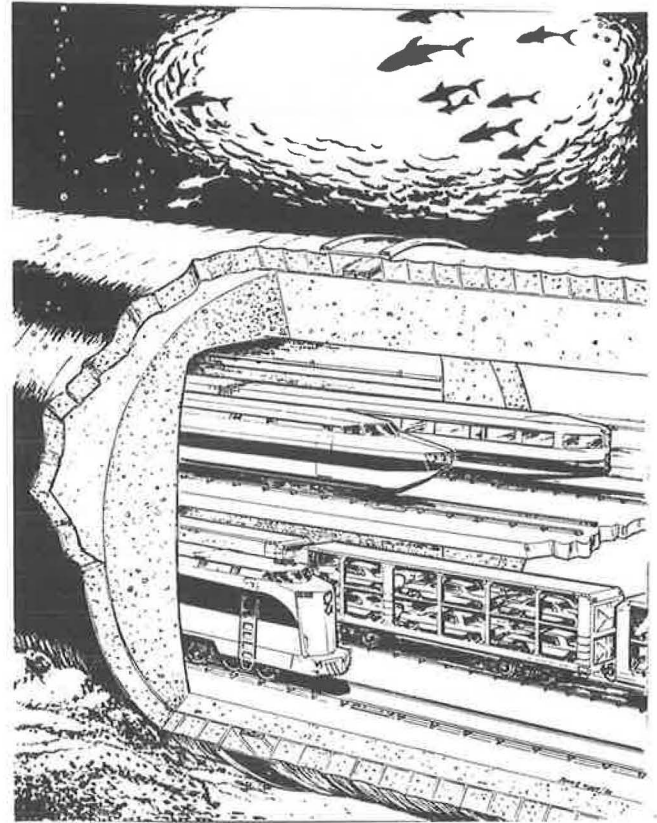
Illustration of a submersible composite-reinforced concrete four-track railway tunnel.
